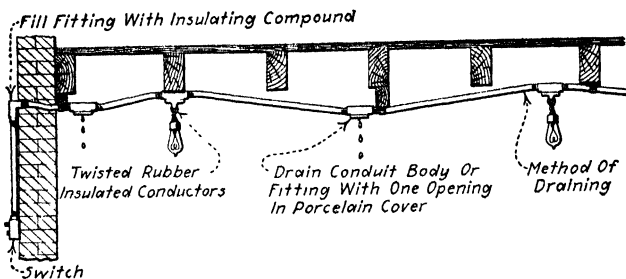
Provision for draining conduit with a conduit fitting between every two outlet bodies. A porcelain cover provided with one hole is used on the "drain conduit fitting."
